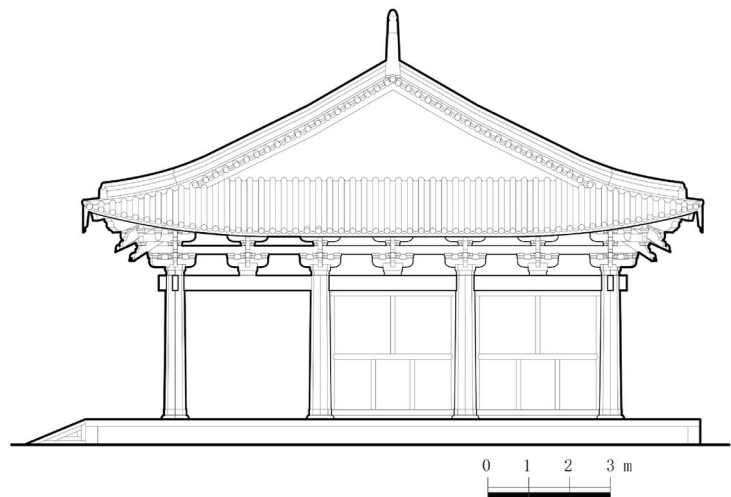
East side elevation of the main hall reconstruction. Drawing by authors.
